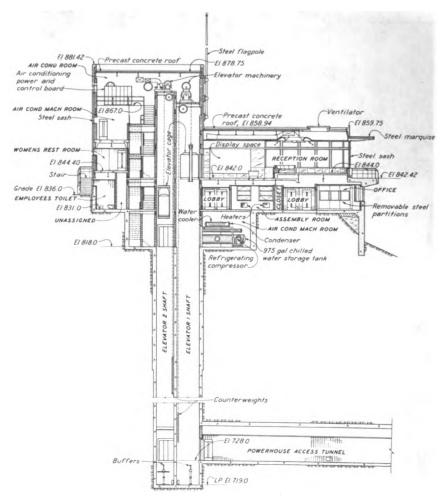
Arrangement of employee and public elevators in control building—Watts
